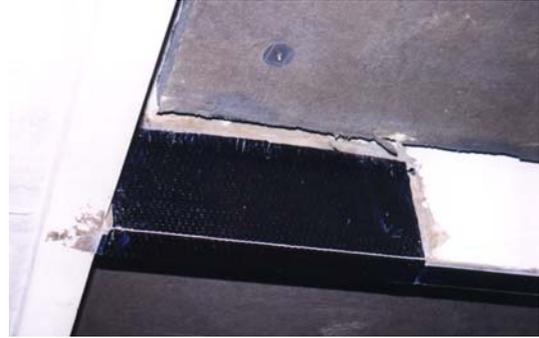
Wet Layup System Used to Anchor Adhesively Bonded Prefabricated Strips in the Saddle Dome
